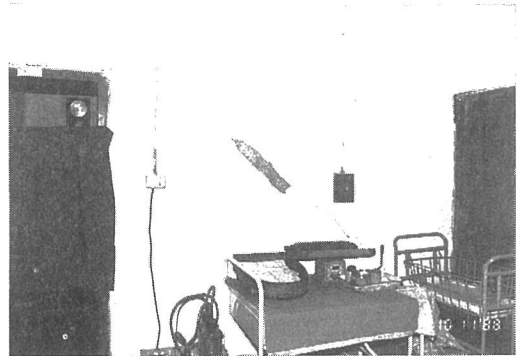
Shear cracks in a brick masonry wall placed within the ward parallel to the undamaged reinforced concrete shear wall (Photo. 3.53), Dharan Hospital, Dharan Bazaar, Nepal
